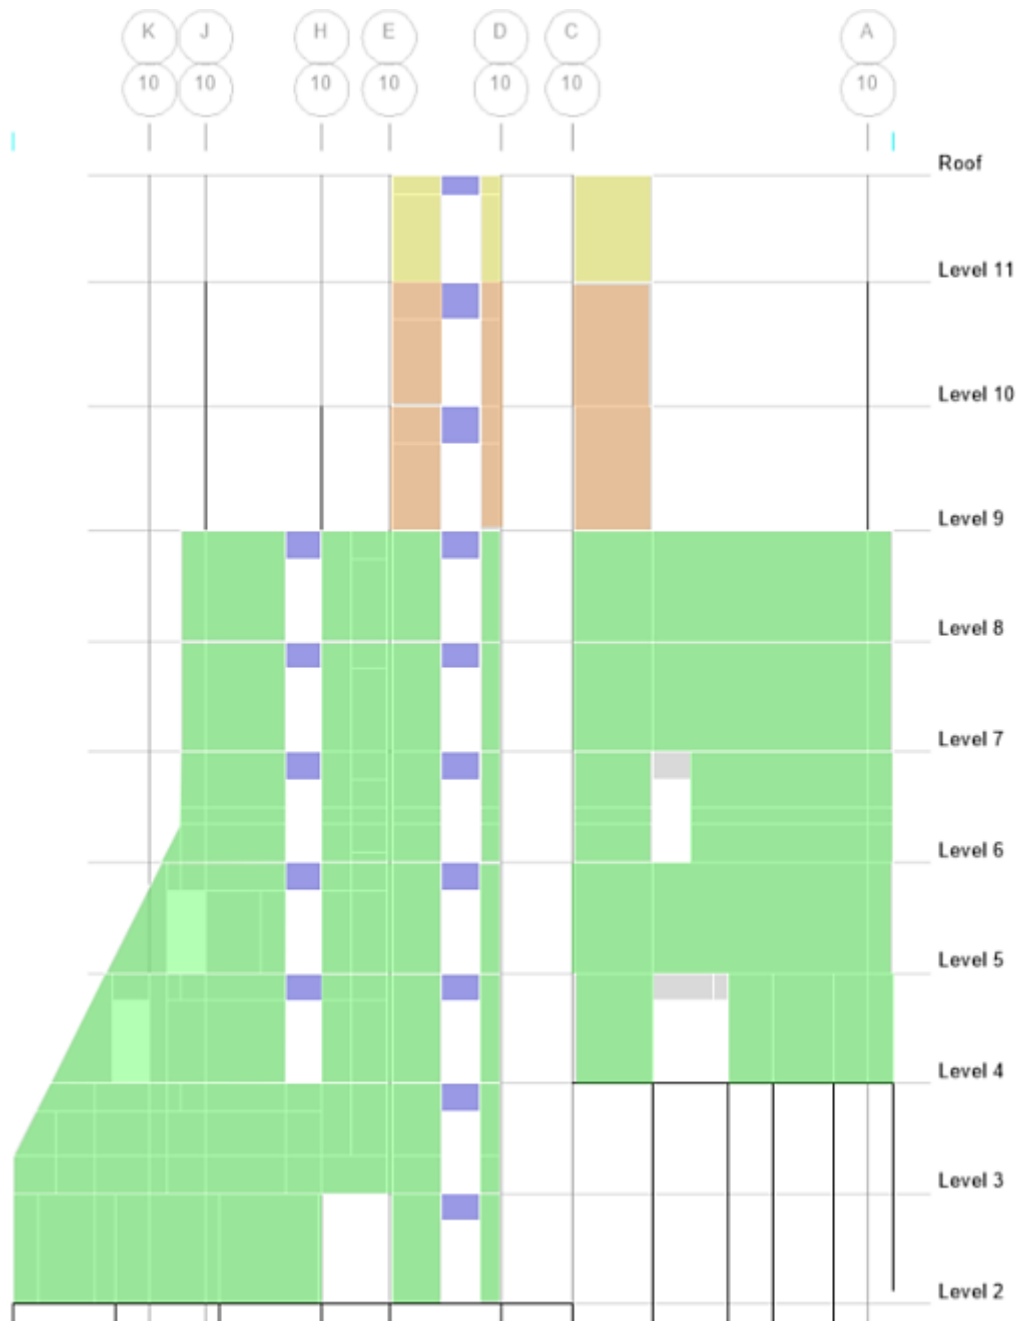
, Gridline 10 Transverse Direction Wall – South Structure
